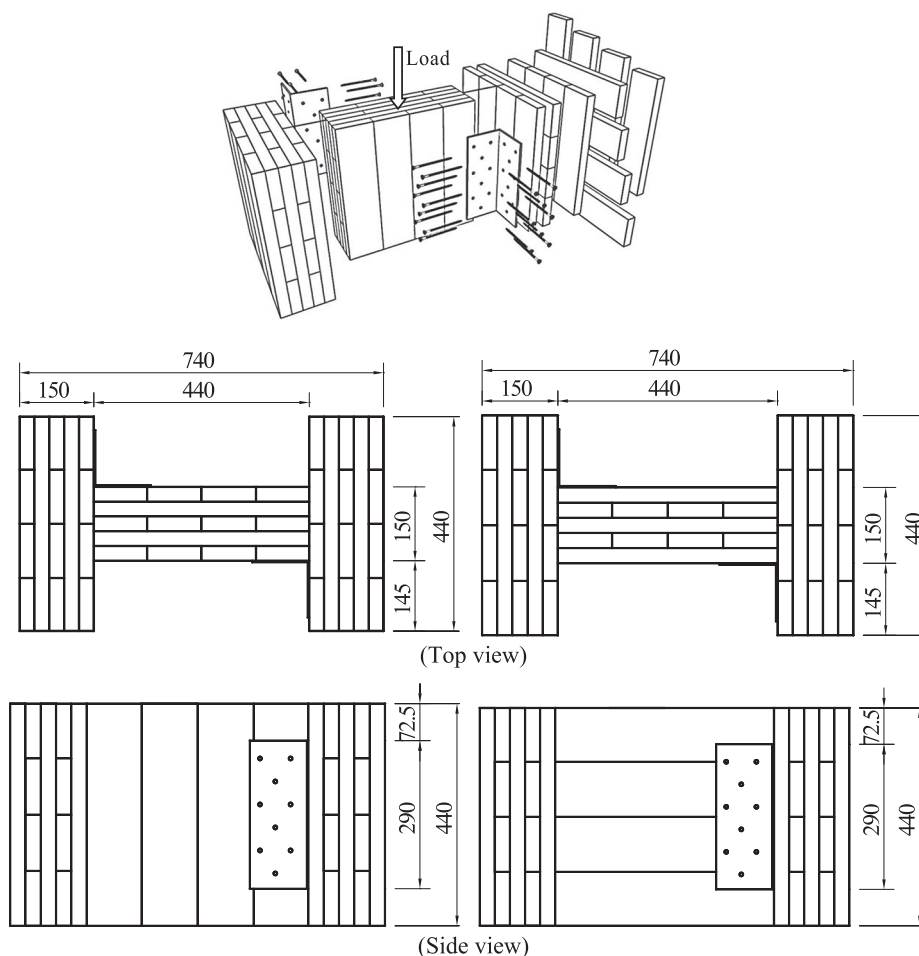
Configuration of L-type connector of cross-laminated timber (CLT) assembly for the shear test, including parallel to the wood grain (left) and perpendicular to the wood grain (right) (units: mm).
